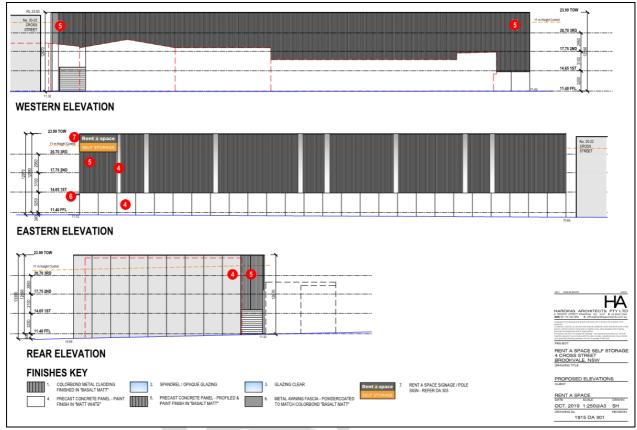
Western, Eastern and Rear Elevations (Source: Harding Architects, 2020)
